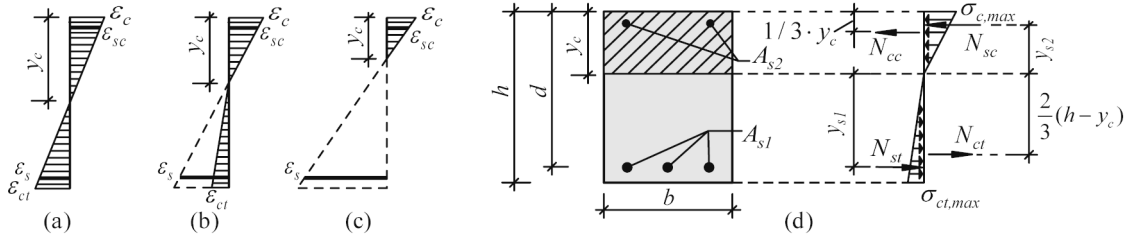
Modelling a bending member: (a), (b), (c) assumed strain distribution in uncracked, arbitrary and cracked sections respectively; (d) internal forces
